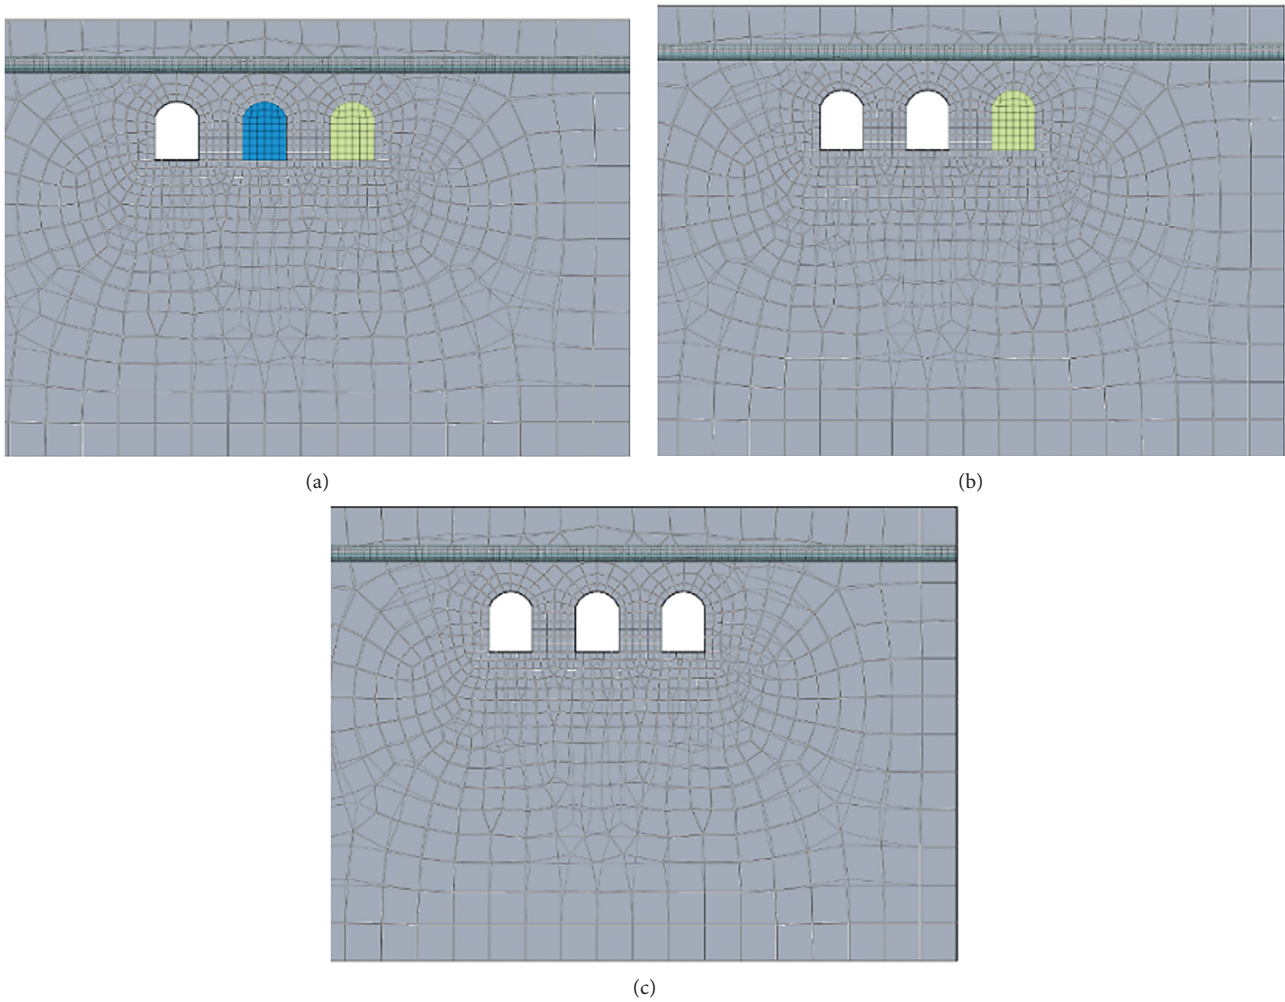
Excavation steps: (a) step 1: excavate section A, (b) step 2:excavate section B, and (c) step 3: excavate section C.
